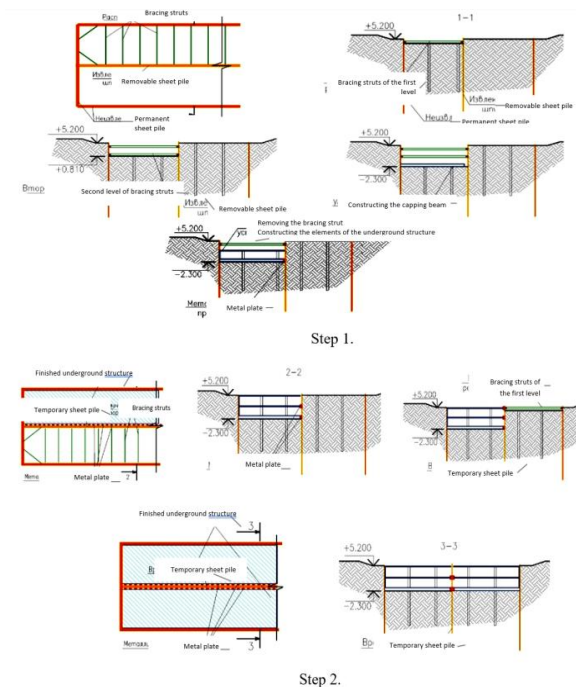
Steps in the construction of two-level underground facilities for separate sections using metal struts and temporary sheet piling
